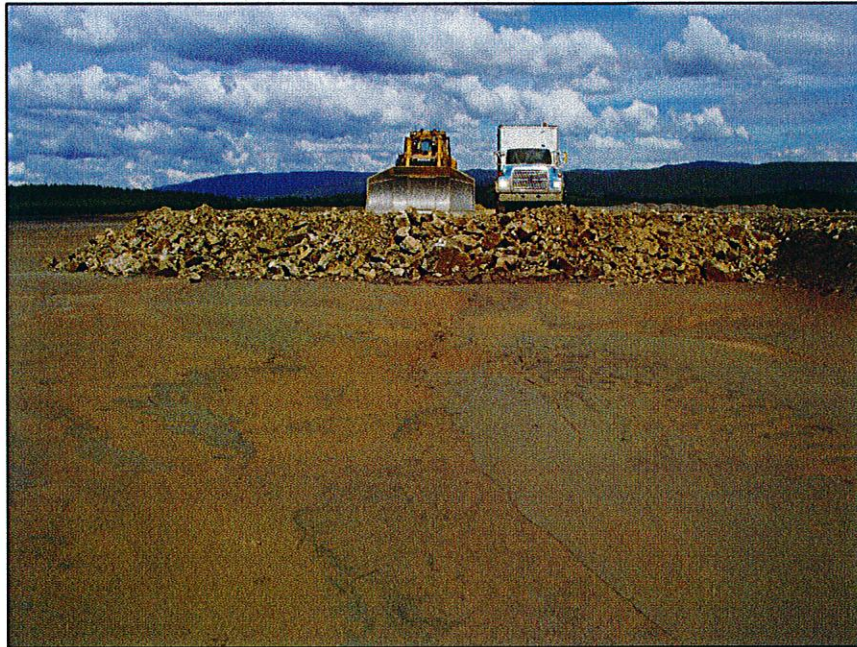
Geotextile placed on the Perimeter Embankment prior to placement of the shell zone.
